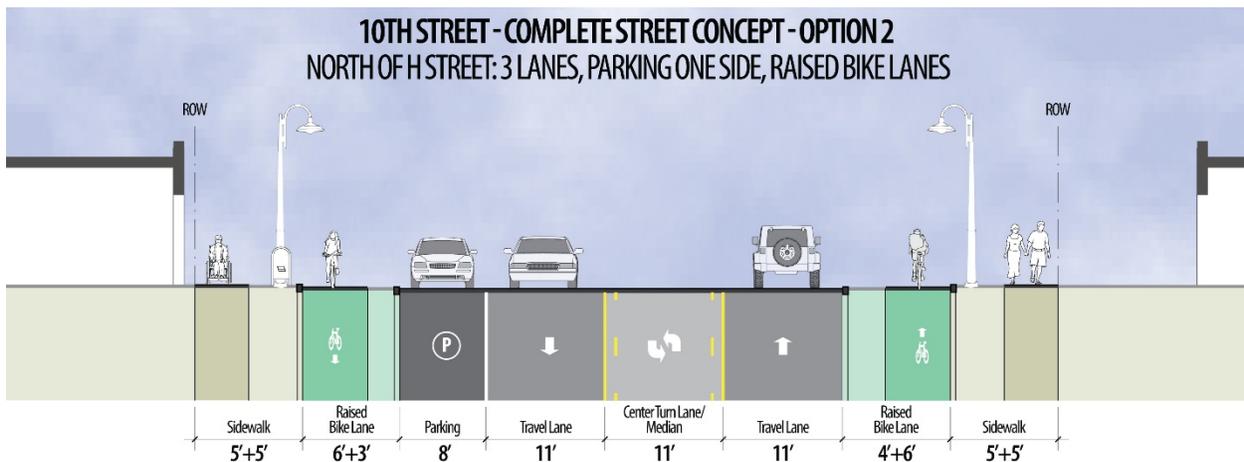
Proposed Complete Street Concept - Option 2 Condition North of H Street
